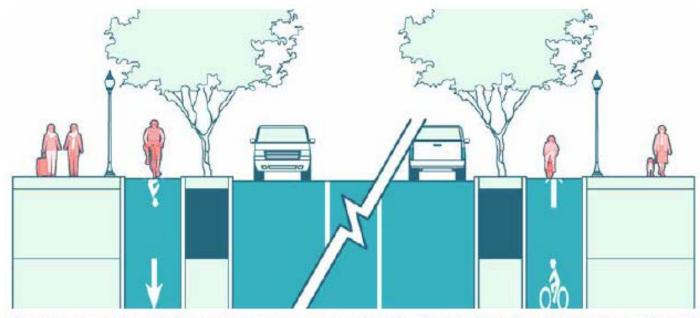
One-way Separated Bike Lane, Tree Separated, Permanent Condition: Downtown Street, Town Center Street, Industrial Street
